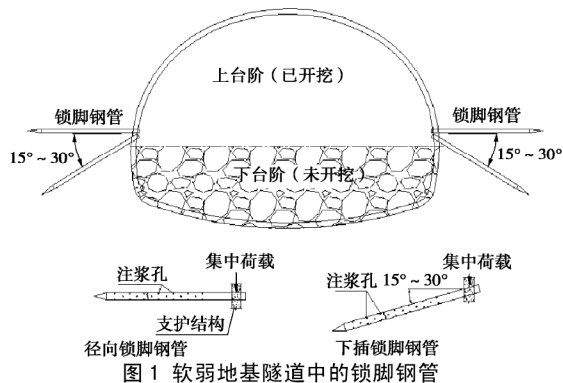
Steel foot pipes for a tunnel in soft foundation
